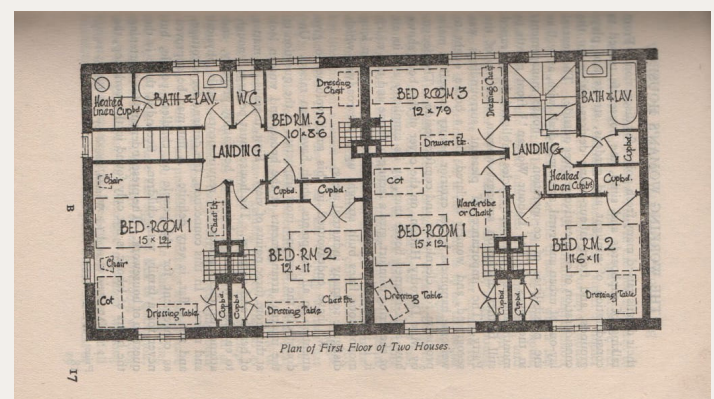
, Plan of first floor of two houses. Source: Sanderson Furniss & Phillips, 1919, P. 17.
